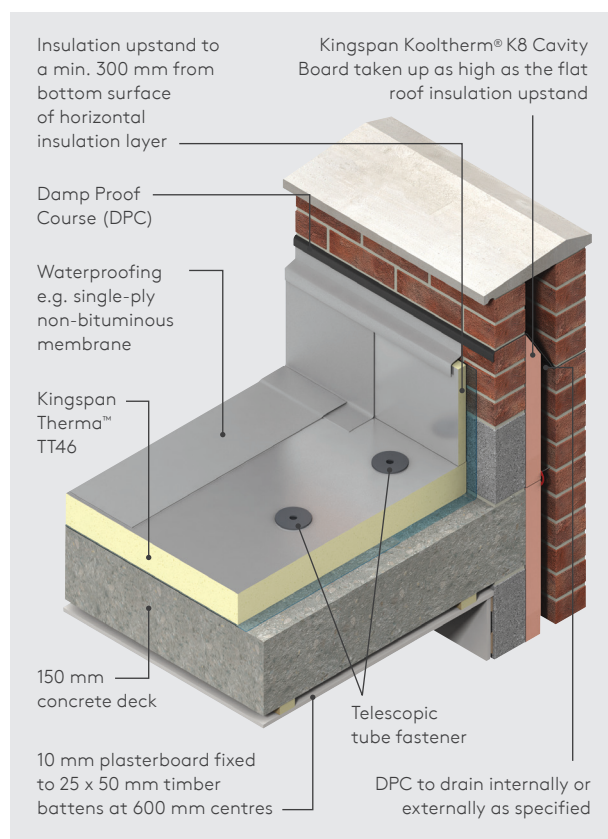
Kingspan Therma™ TT46 in a Dense Concrete Deck with Suspended Ceiling.
